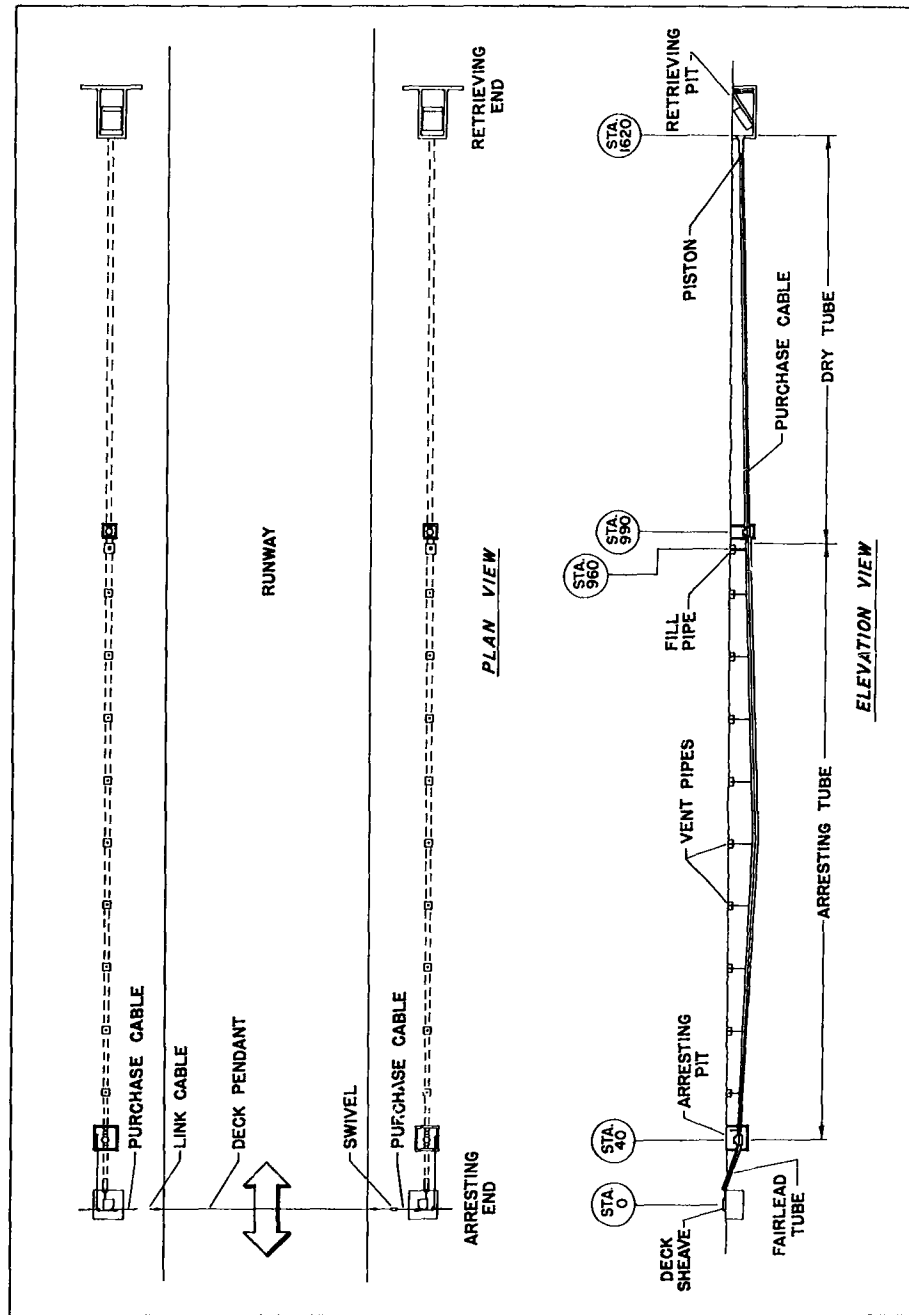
Typical Plan and Elevation View of Model 3500 Arresting Gear Installation
